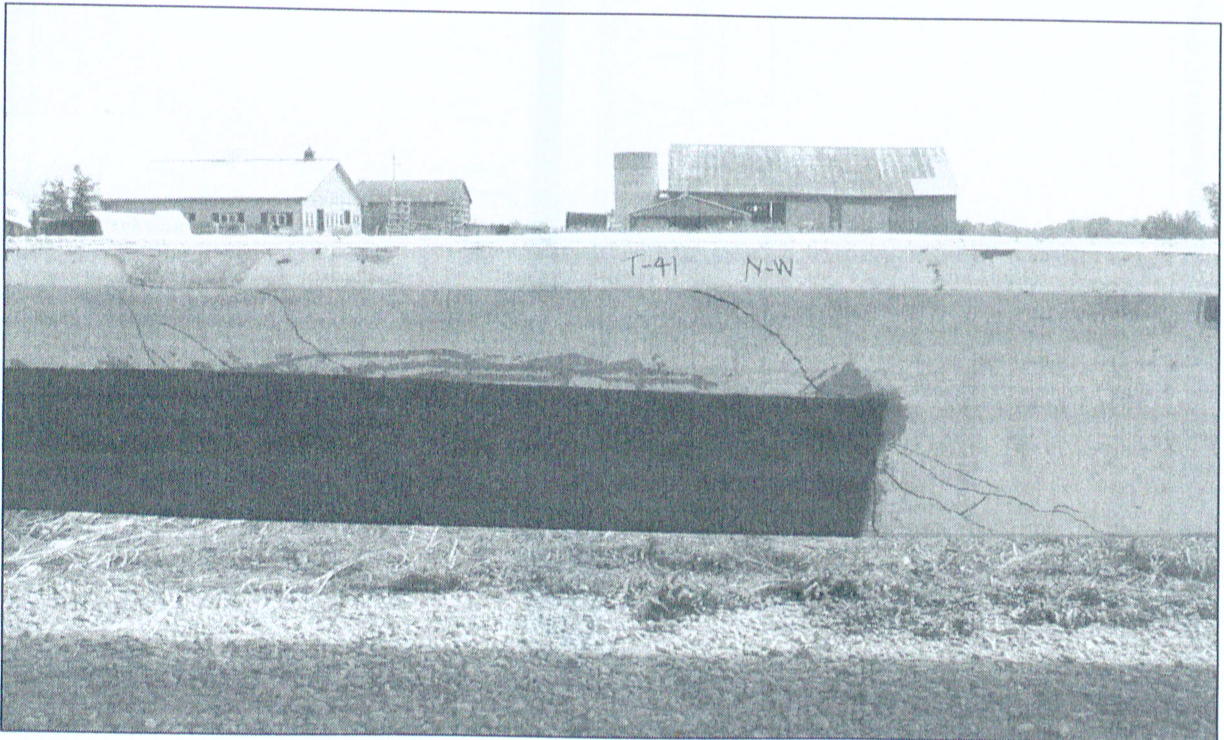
Crack pattern of DT-41 girder after load removal (Cofini, 2005)
